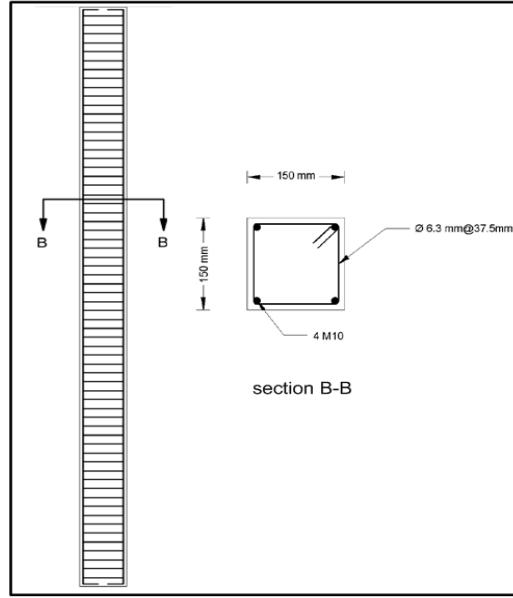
Column dimensions and reinforcement detailing for Kadhom column.
